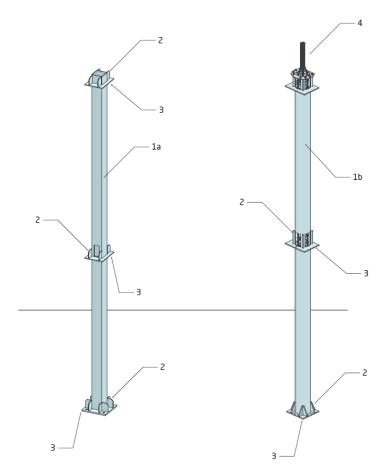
Multi-story columns: external hollow steel elements with square (1a) or circular (1b) cross-section; (2) additional welded steel reinforcements outside the hollow steel element; (3) base and top steel plates (welded with the other parts), provided in order to connect the column to the foundation or to other beam or column elements; (4) internal reinforcement cage of deformed steel bars
